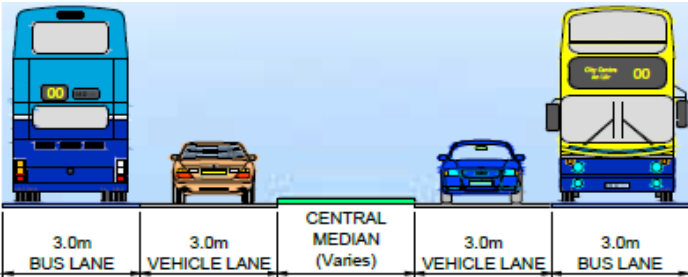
EPR Option A on Finglas Road North – Cross Section
